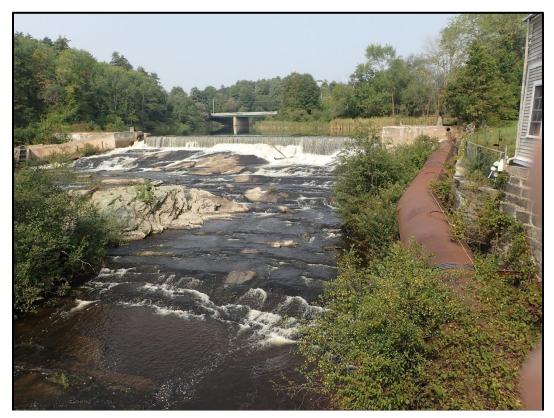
Bridge Street Dam, Royal River, Yarmouth, Maine
